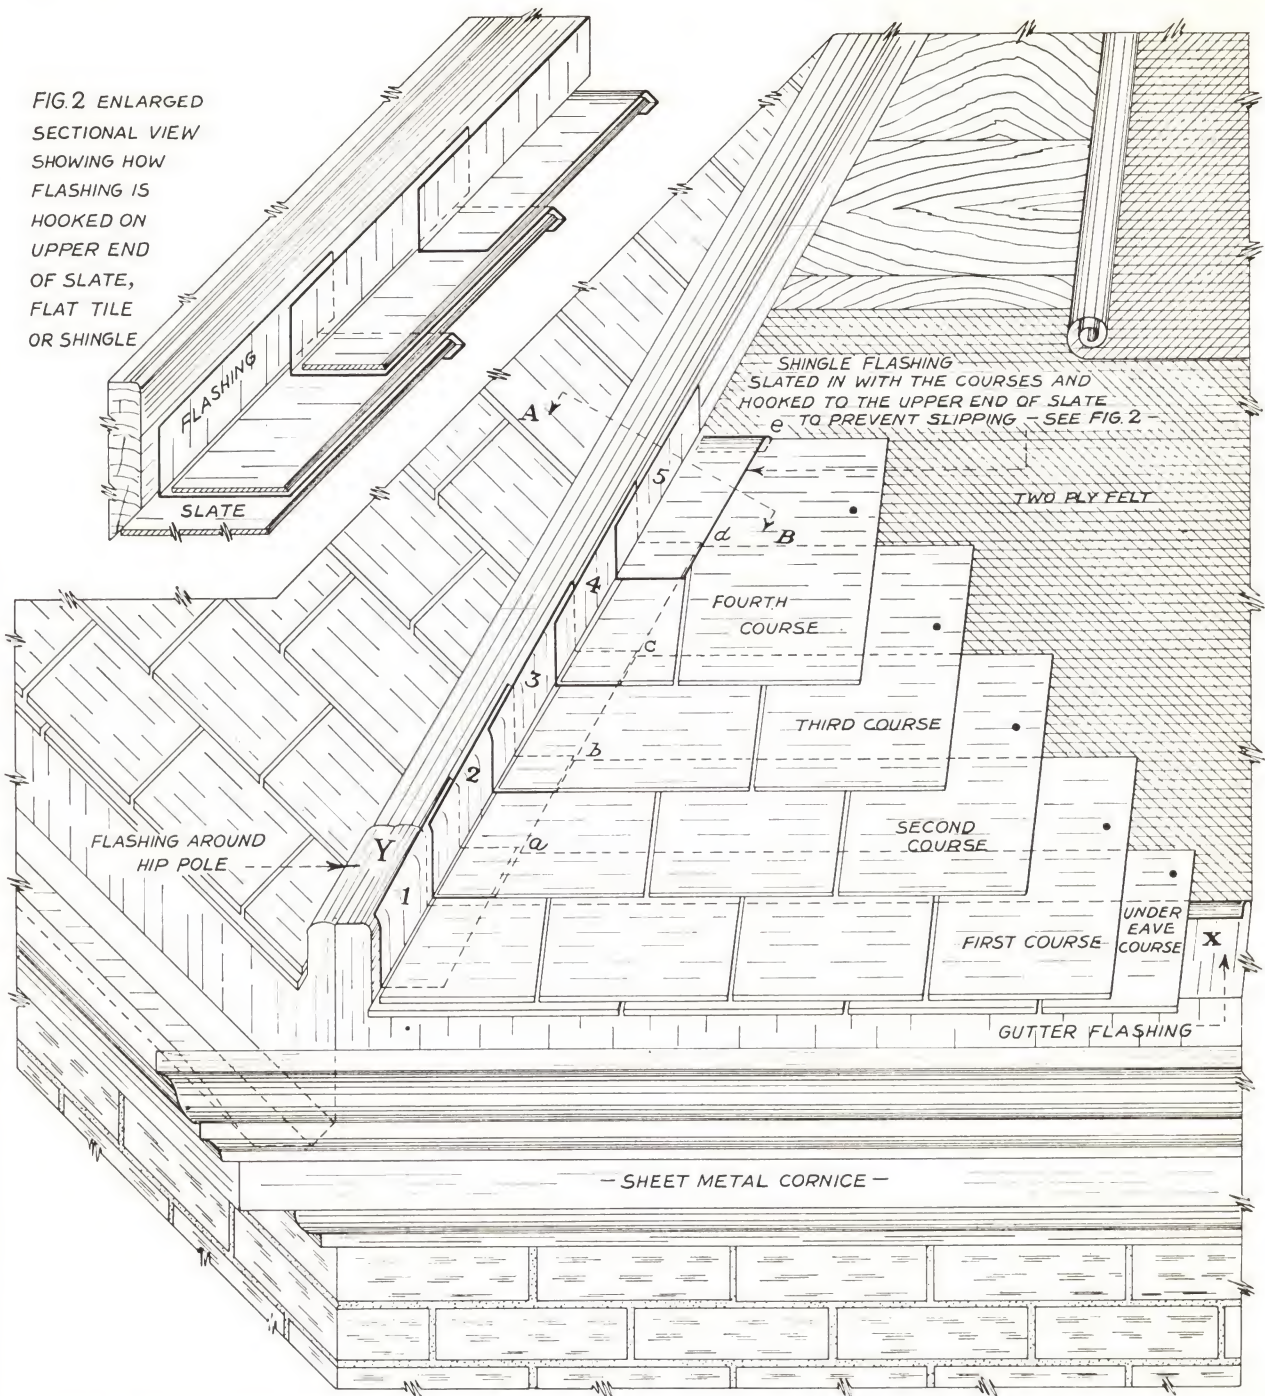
METHOD OF USING SHINGLE FLASHING AT HIP IN CONNECTION WITH SLATE, FLAT TILE AND SHINGLE ROOFING
